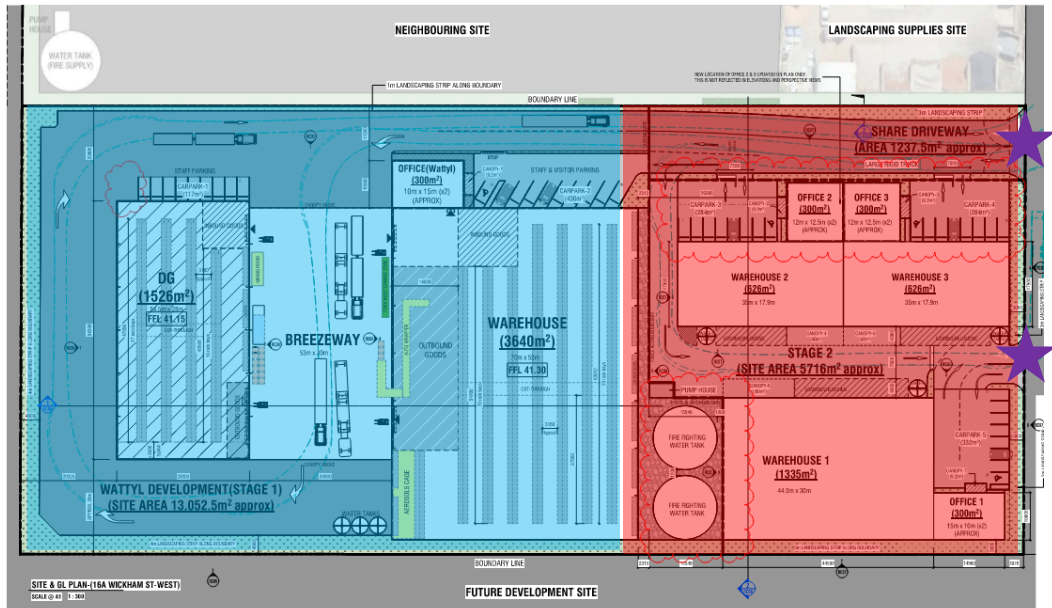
Proposed layout (Stage 1 = blue shading, Stage 2 = red shading, purple stars = vehicle crossings)
